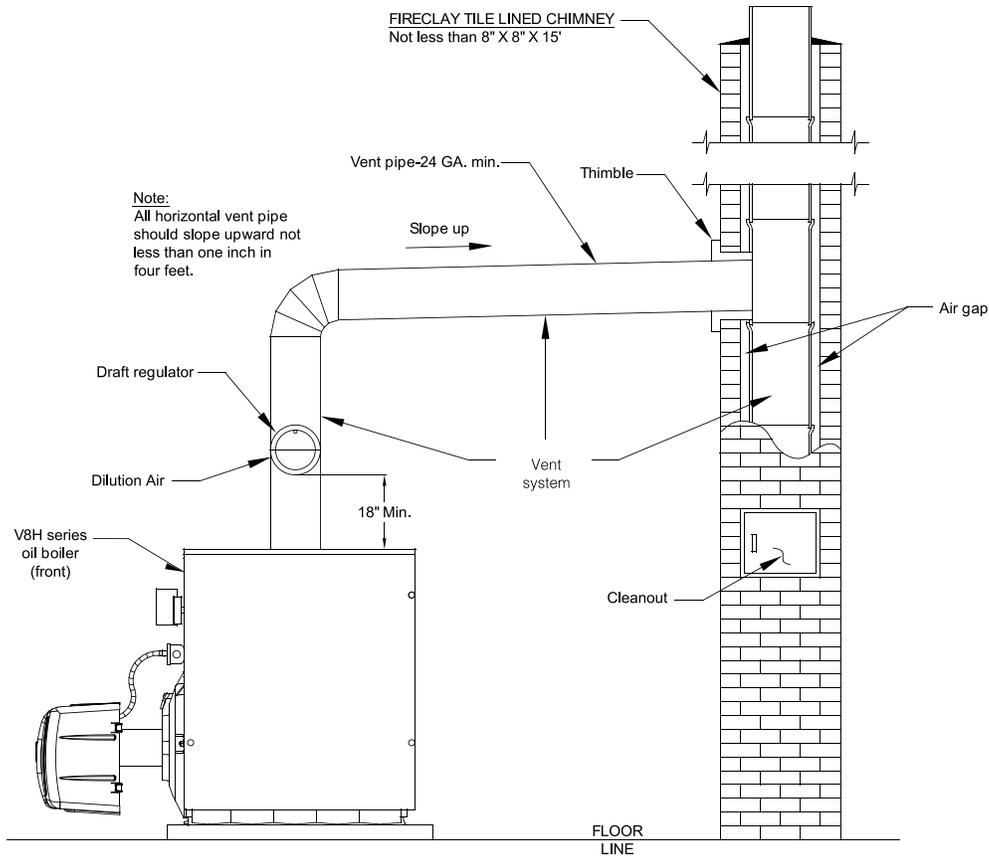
Recommended Vent Pipe Arrangement and Chimney Requirements
